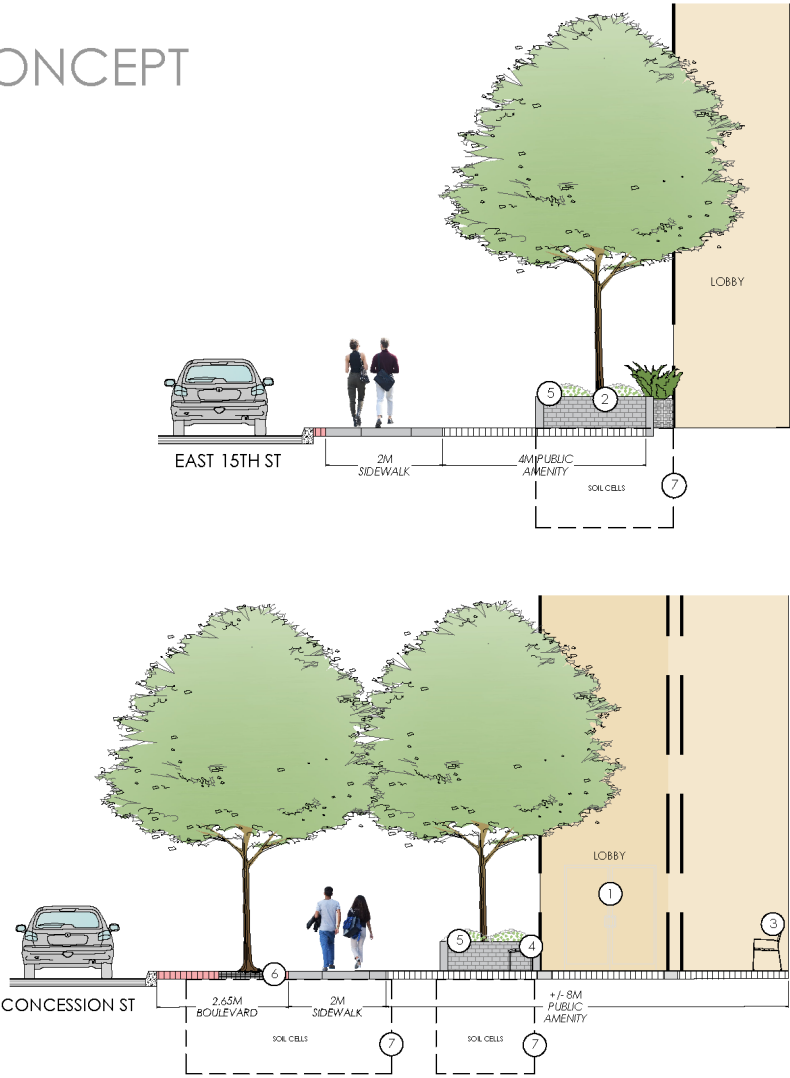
STREETSCAPE SECTIONS. PREPARED BY ADESSO DESIGN INC.
